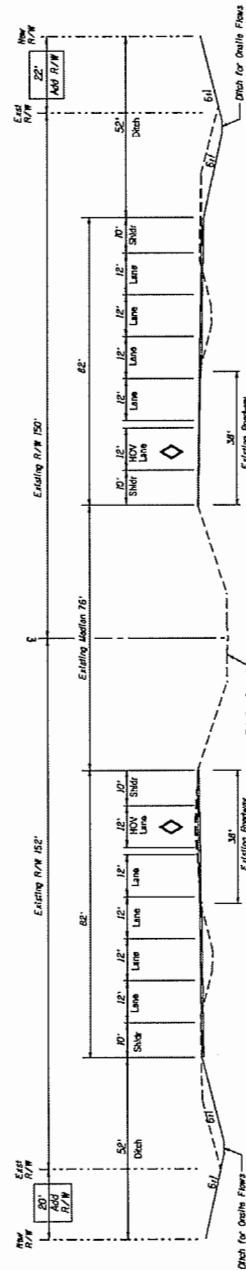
TYPICAL SECTIONS – OUTSIDE WIDENING (CONT.)
